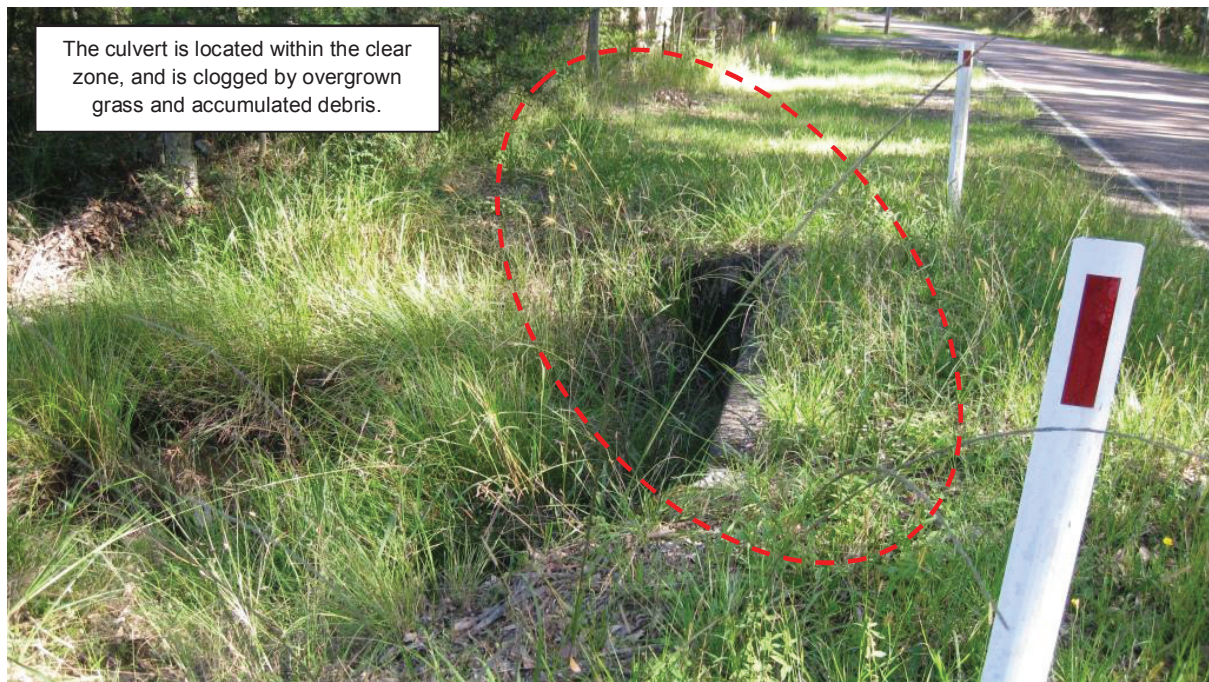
Hue Hue Road, looking south on the section between Bushells Ridge Road and Sparks Road
